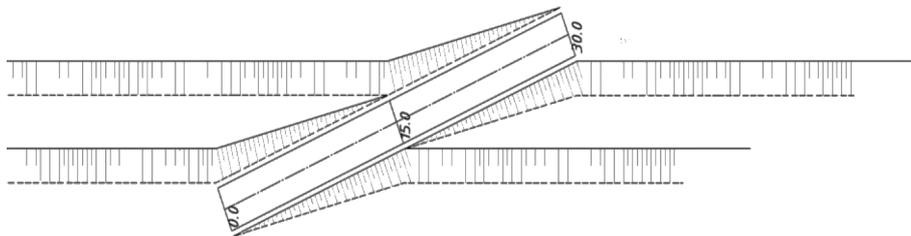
Scheme of exit trails of auto transport without horizontal sections
